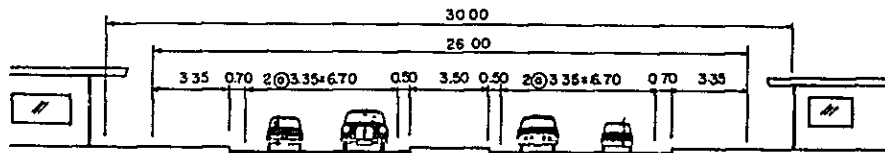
LONG TERM CROSS SECTION OF VIA EL PAICAL
